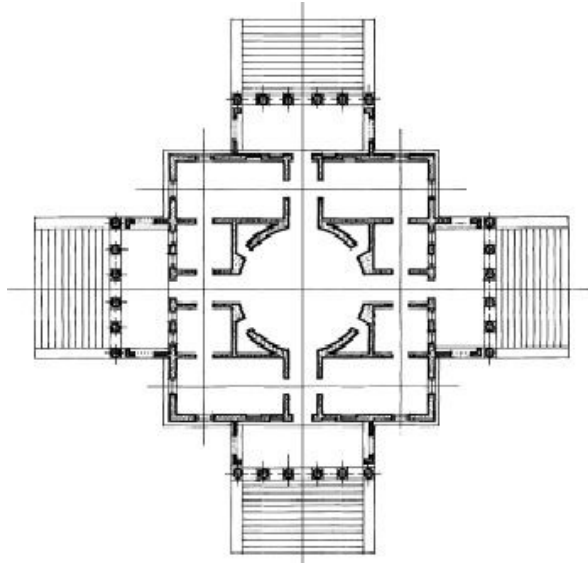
Villa Capra's Floor Plan (Source : Carolyn McDowall , 2012)
